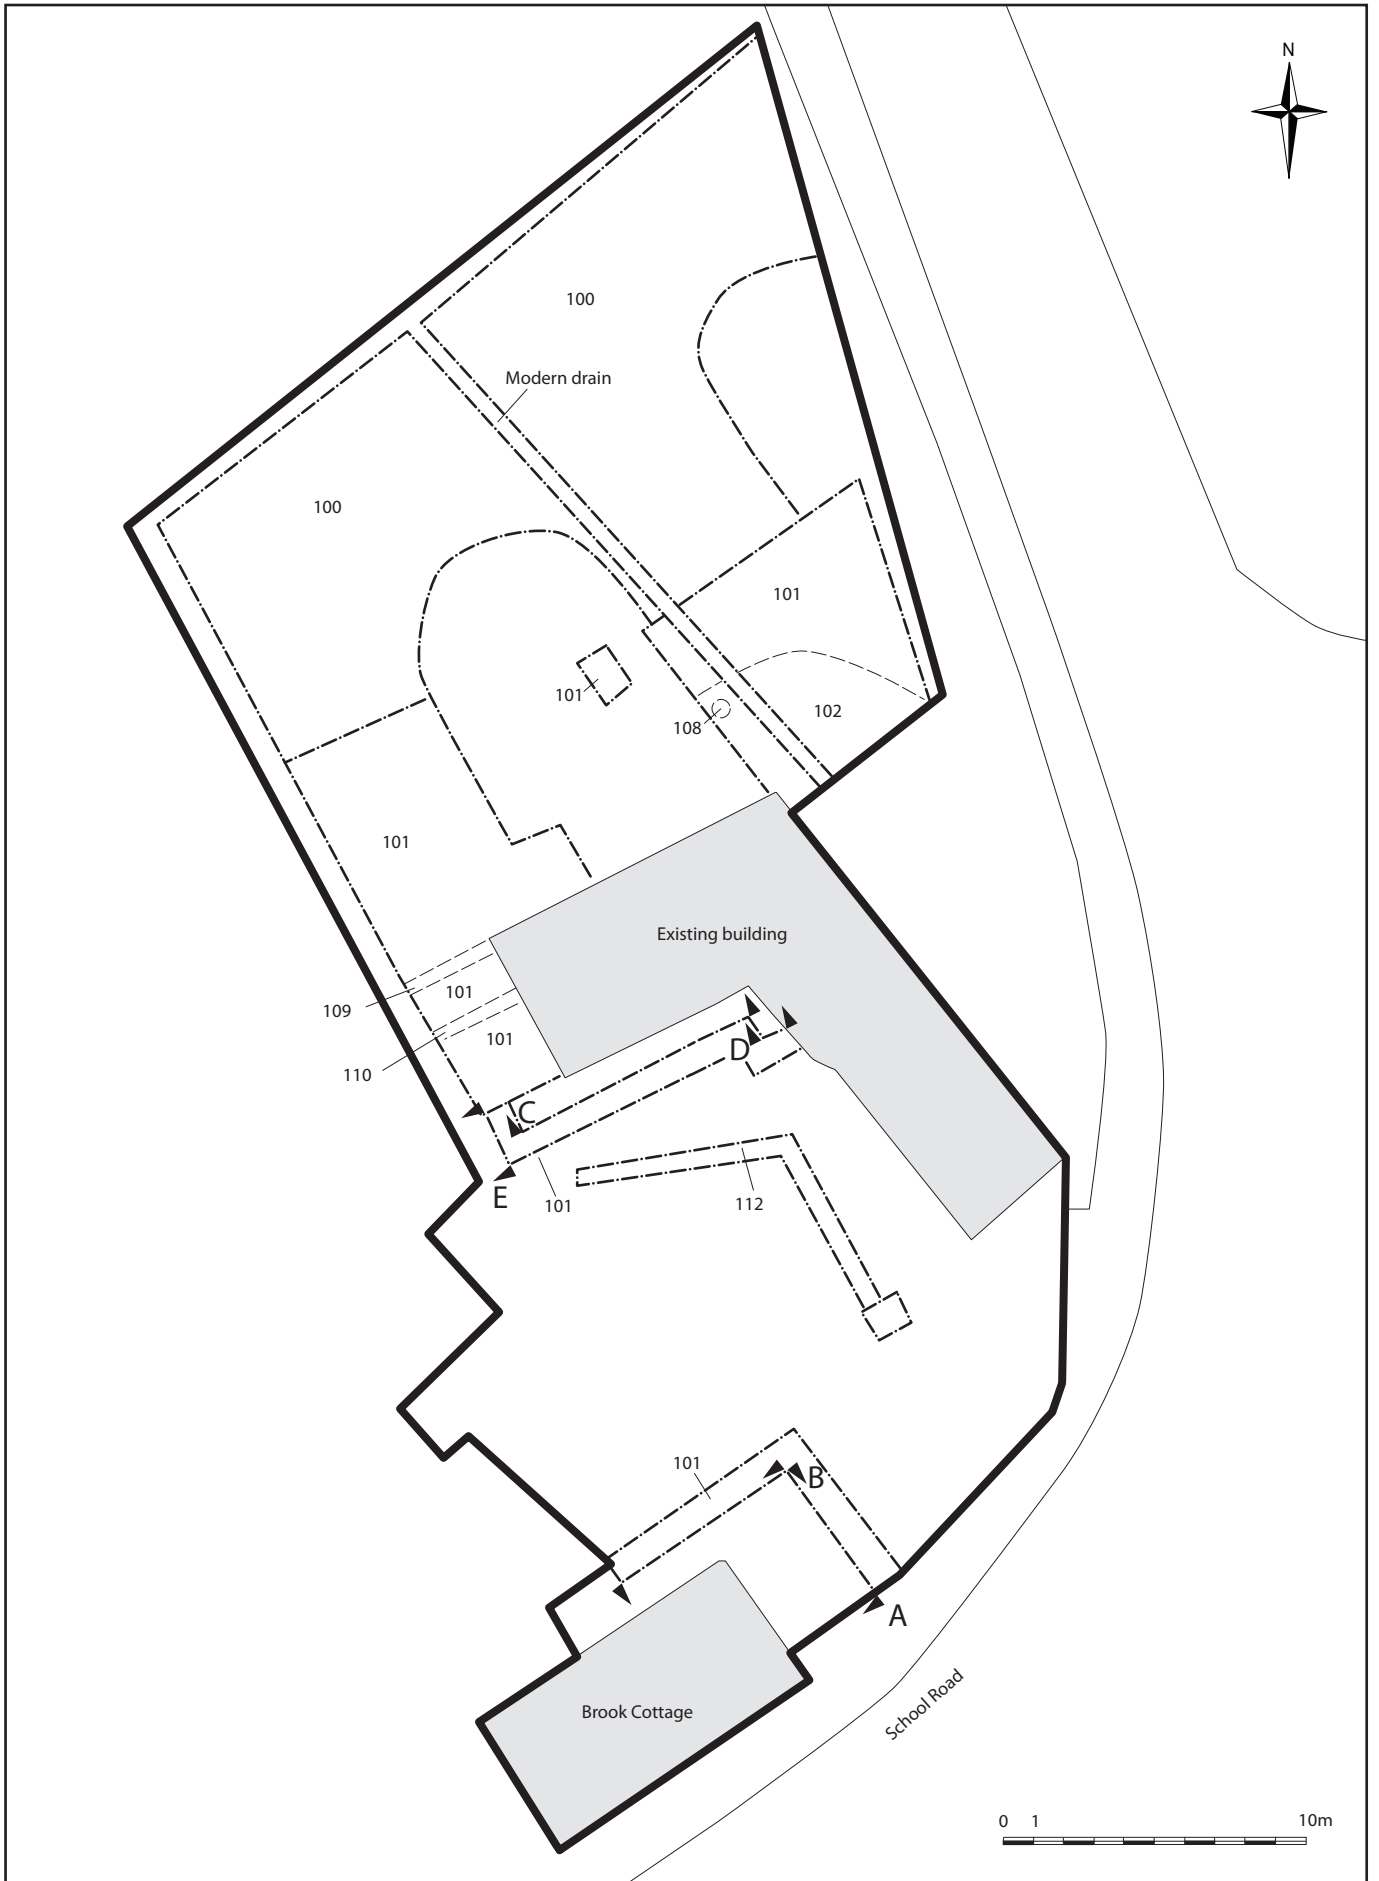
Site plan depicting areas stripped of topsoil, foundation and service trenches
